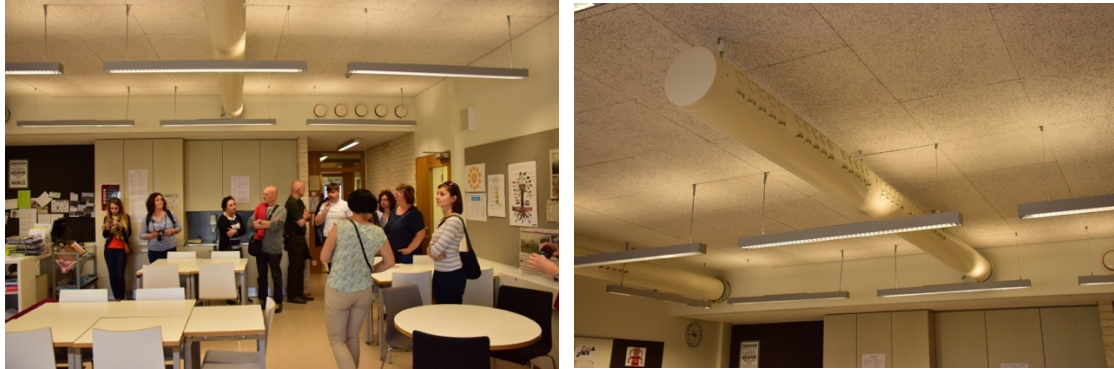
Classroom and mechanical ventilation (source: InAirQ team)
